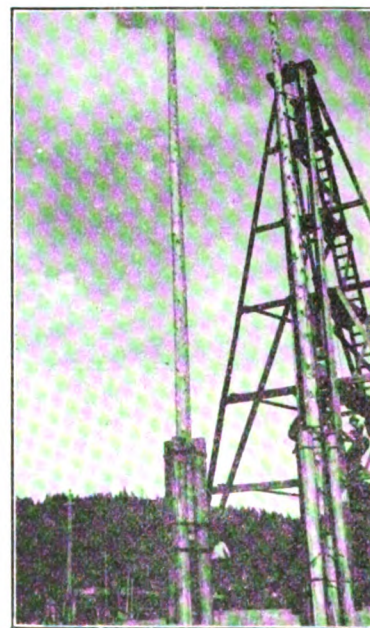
ERECTION OF STRUCTURE ON PILE FOOTING
